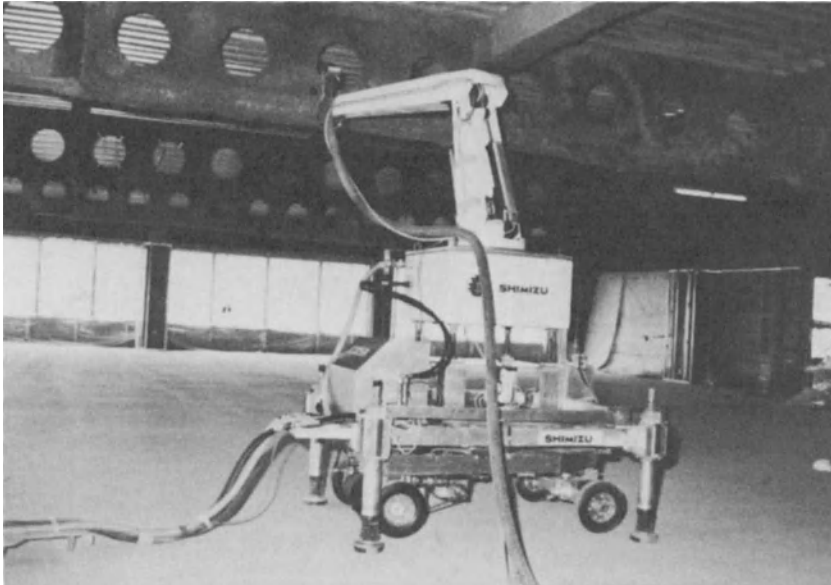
SSR-2 (Shimizu Site Robot -2)
